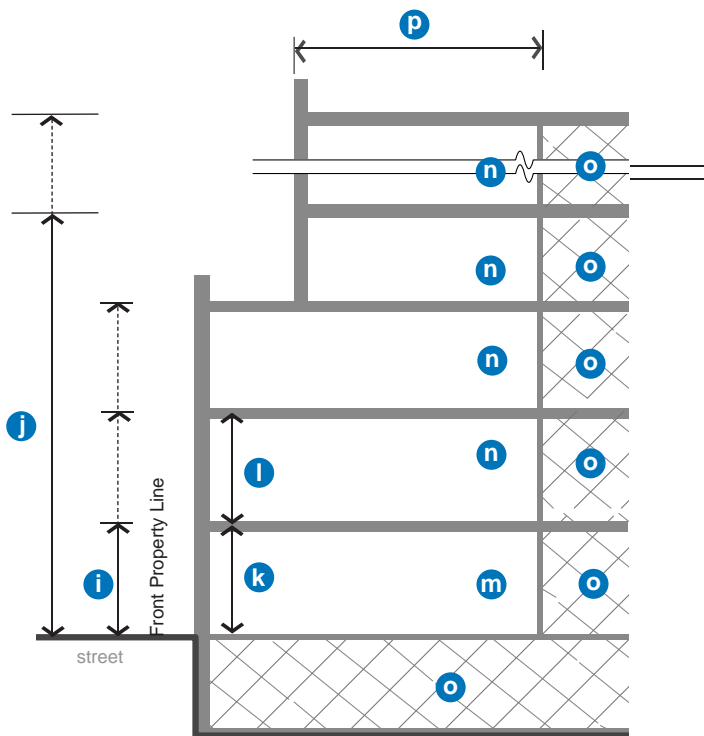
(2) General Stoop Building: Height and Use Requirements
